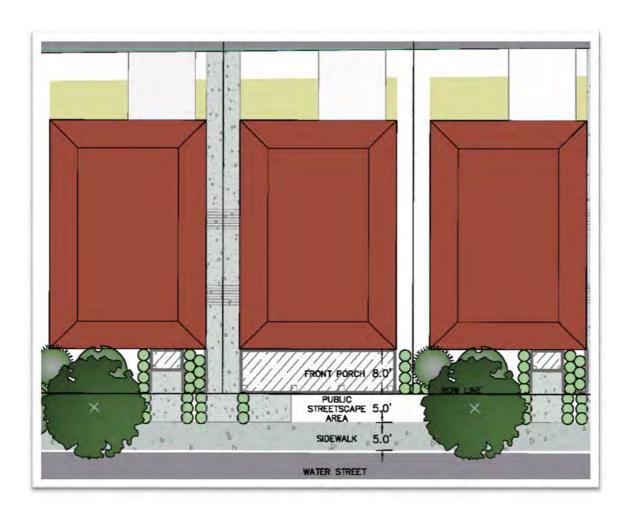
Public Streetscape Dimension Exhibit (Not to Scale)
